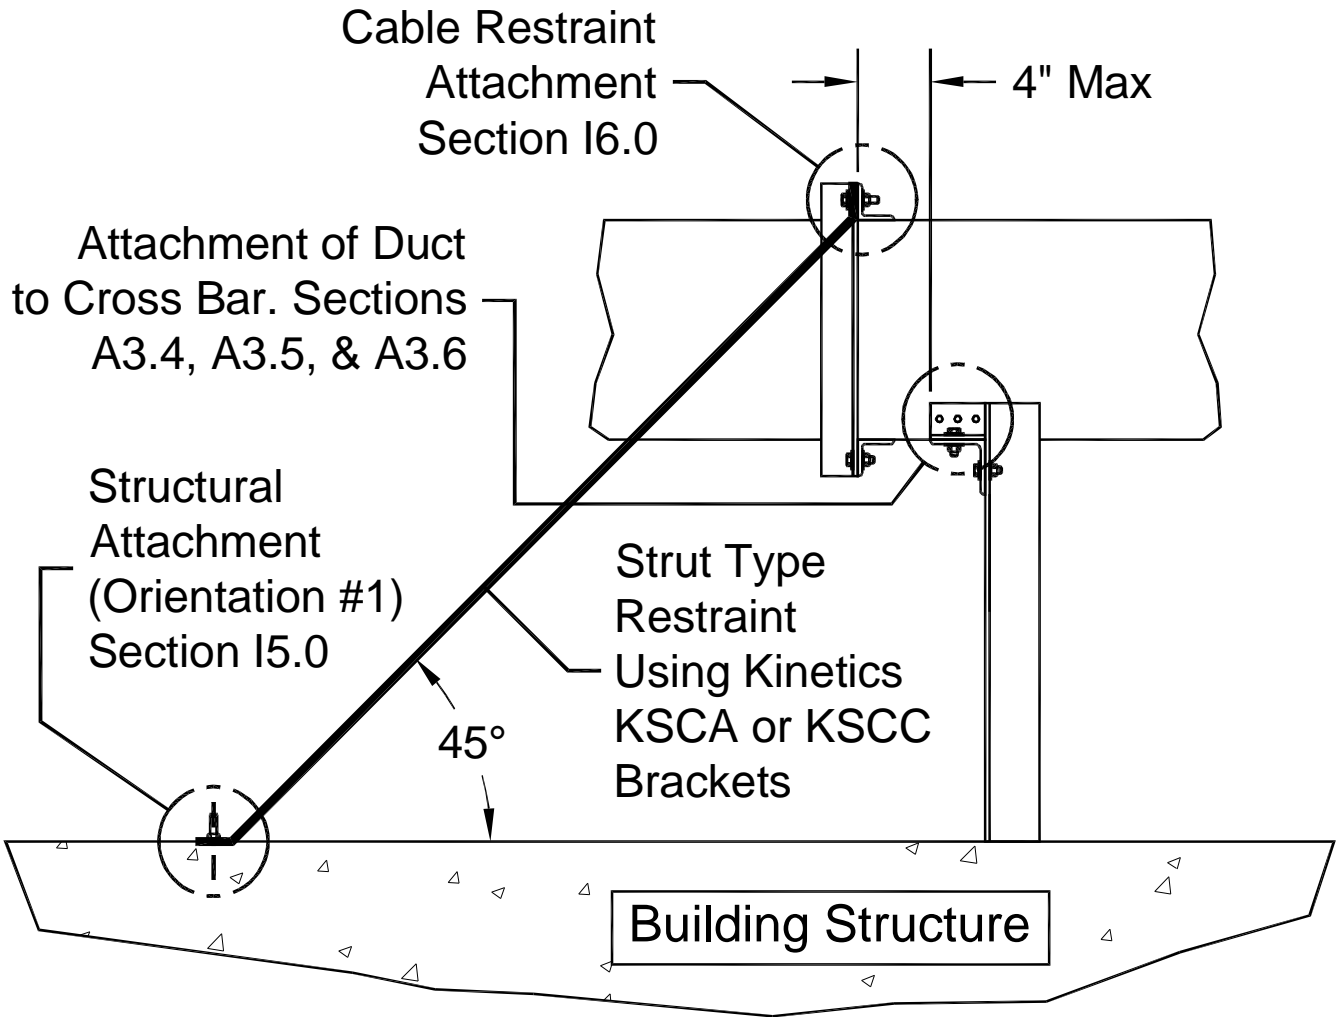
; Longitudinal (L) Strut Type Restraint Schematic for Floor/Roof Mounted Duct – Strut Attached to the Duct at a 45° Angle
